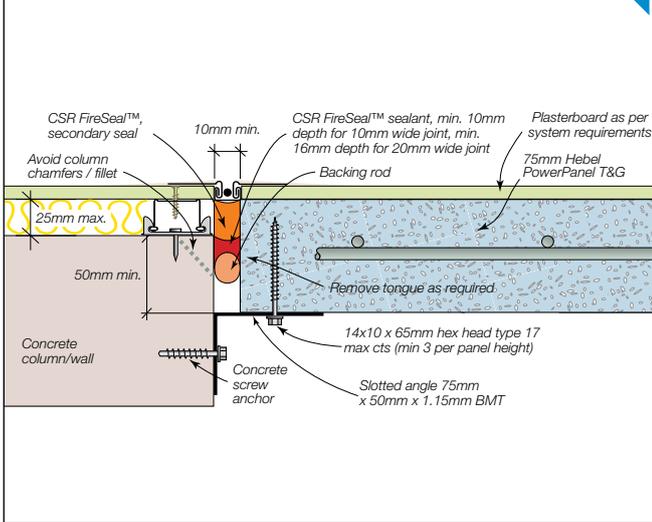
Offset panel to column with CSR FireSeal™ fillet
